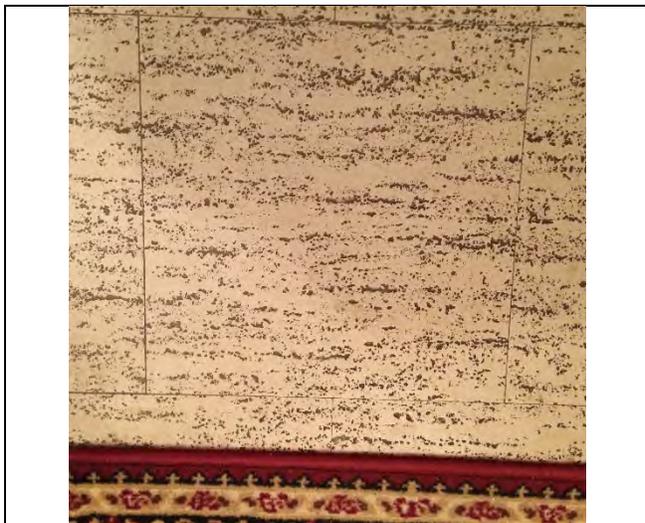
12"x12" vinyl floor tile – beige with grey specks identified to be asbestos-containing (4.08% Chrysotile).
